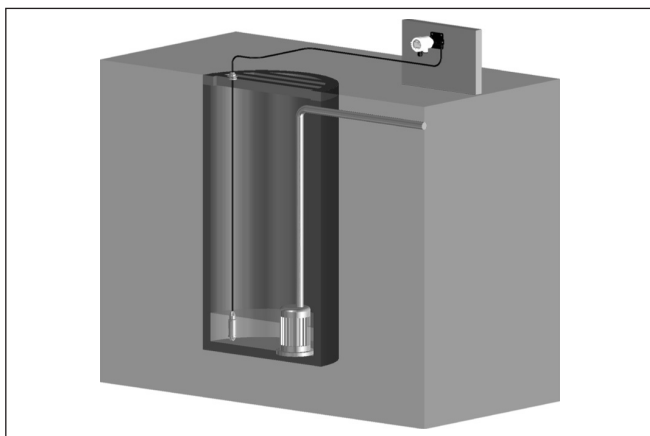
Mounting example: Version with suspension cable in a pump shaft
